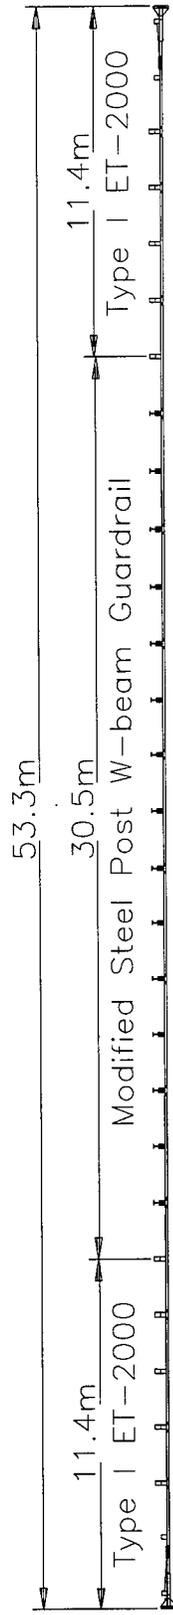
Layout of the TxDOT guardrail on steel posts installation before test 439637-1.
